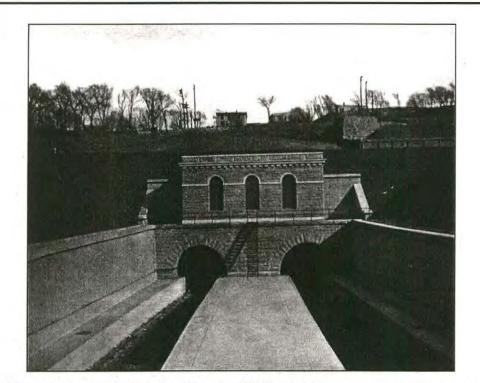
Hackensack Portals of Bergen Hill Tunnel (The New York Improvement and Tunnel Extension of the Pennsylvania Railroad p. 26.)
